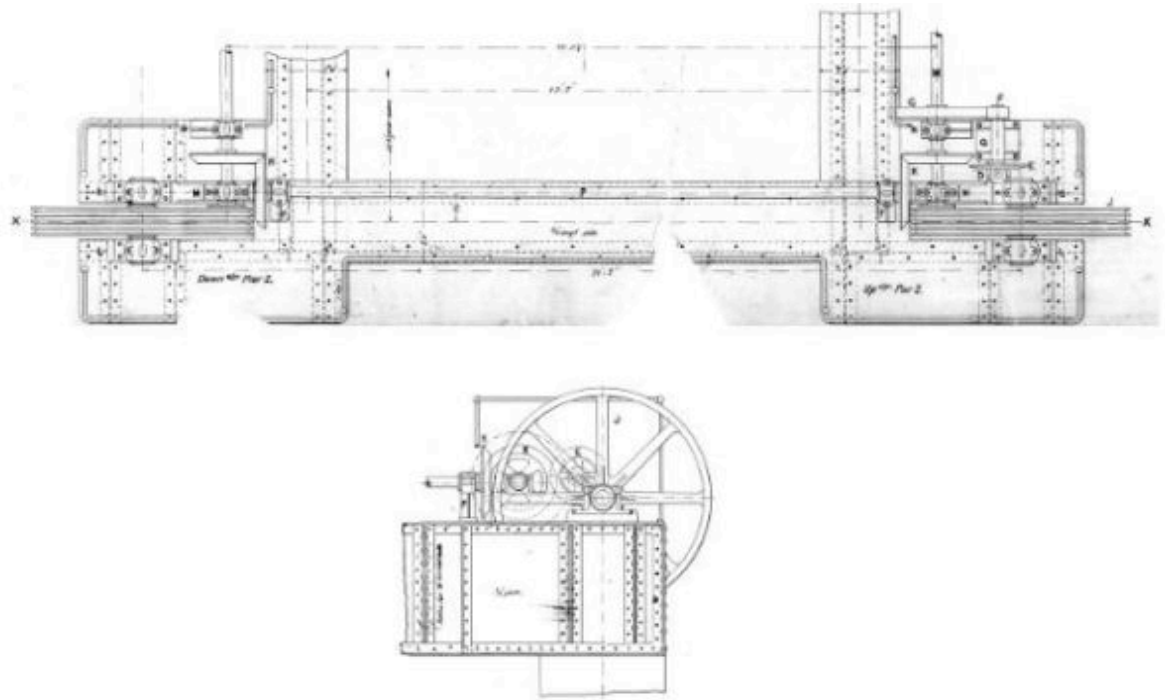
Plans of the similar design that was adopted at Swan Hill Bridge
